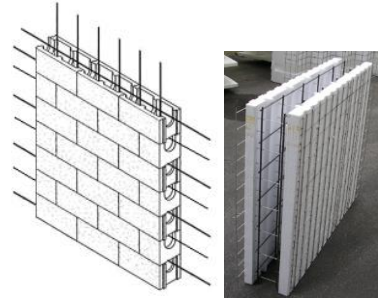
Examples of solutions for reinforced-concrete walls (left: Isotex, right: Trombetti).
